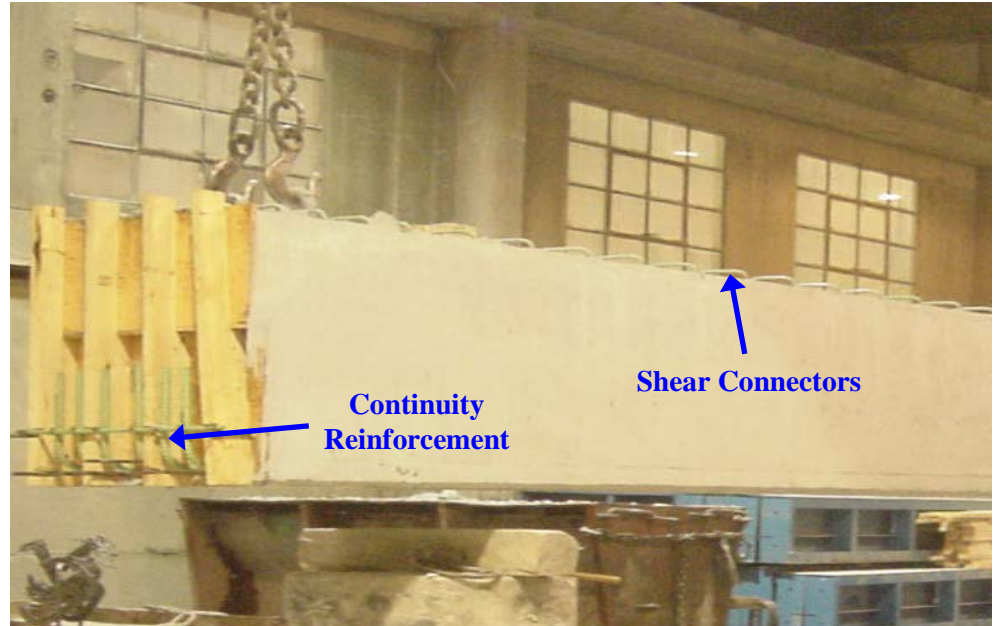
Box Beams at Fabrication Plant Showing Stirrups Extended as Shear Connectors and Extended Reinforcement for Continuity
